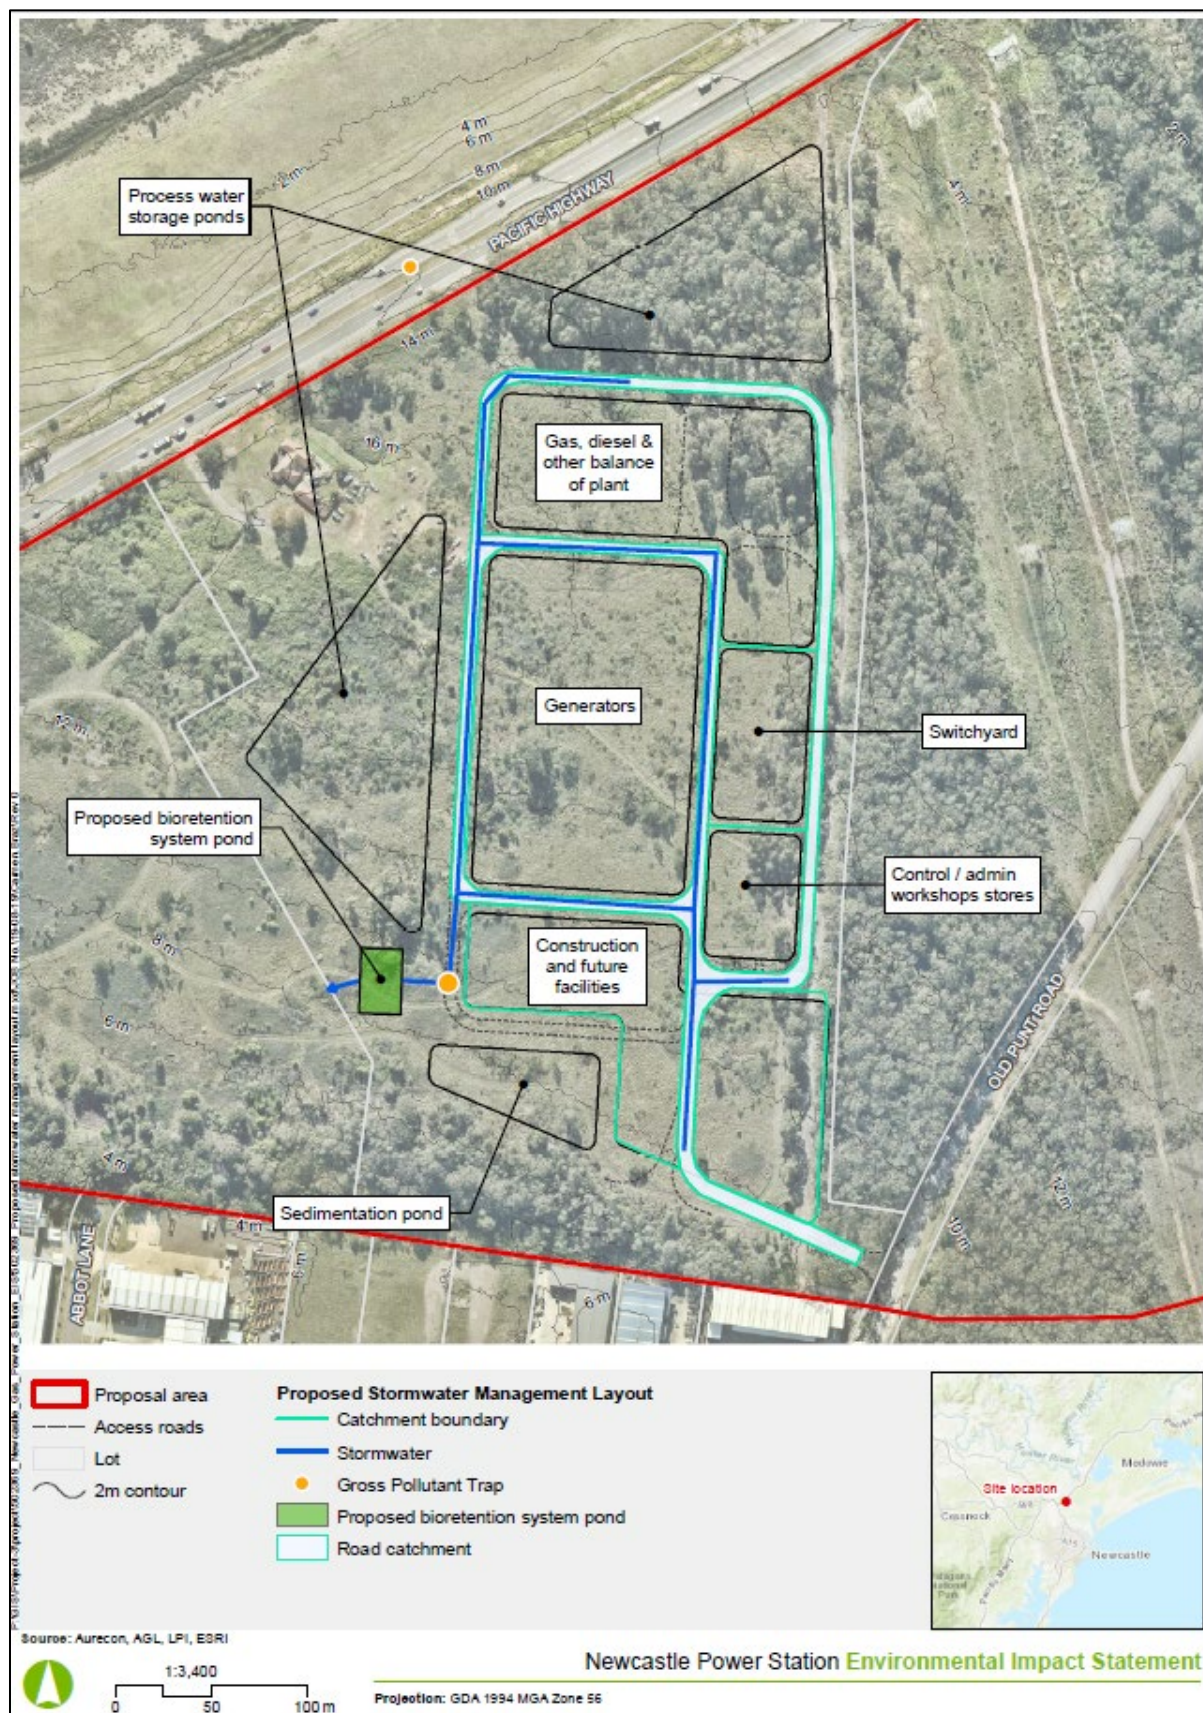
Proposed Indicative Stormwater Management – Site Layout
